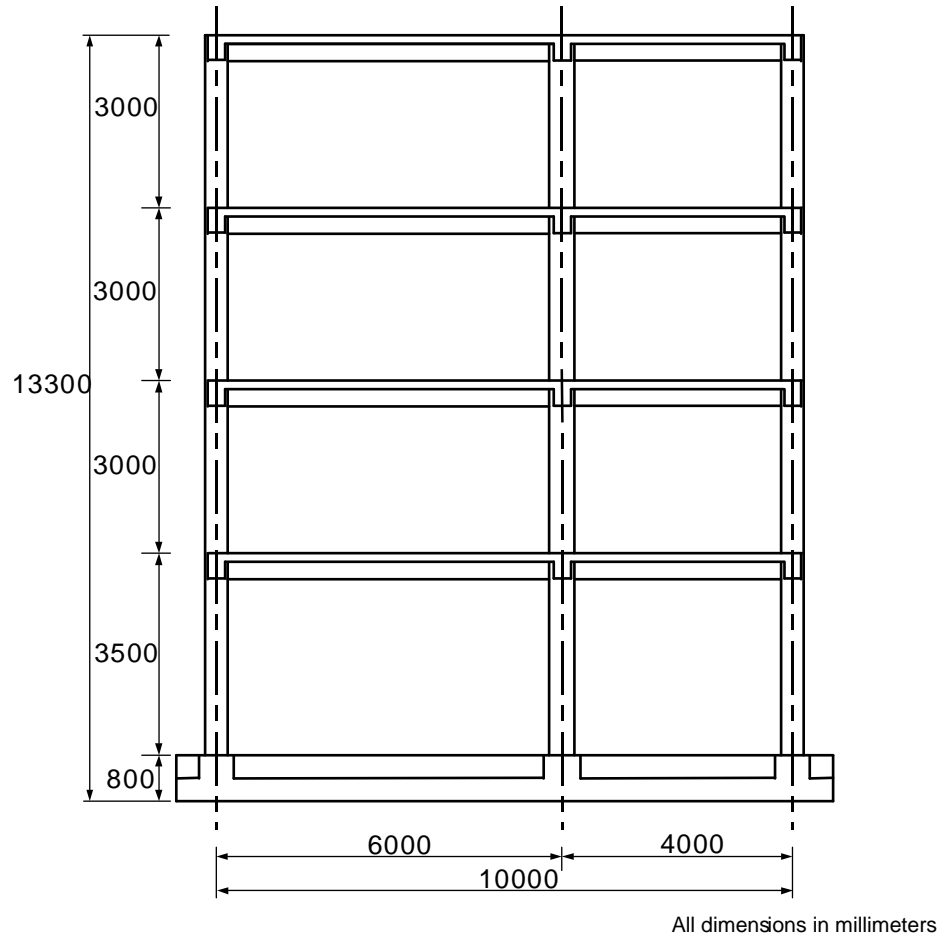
Elevation of Building (Adapted from 4-14)
